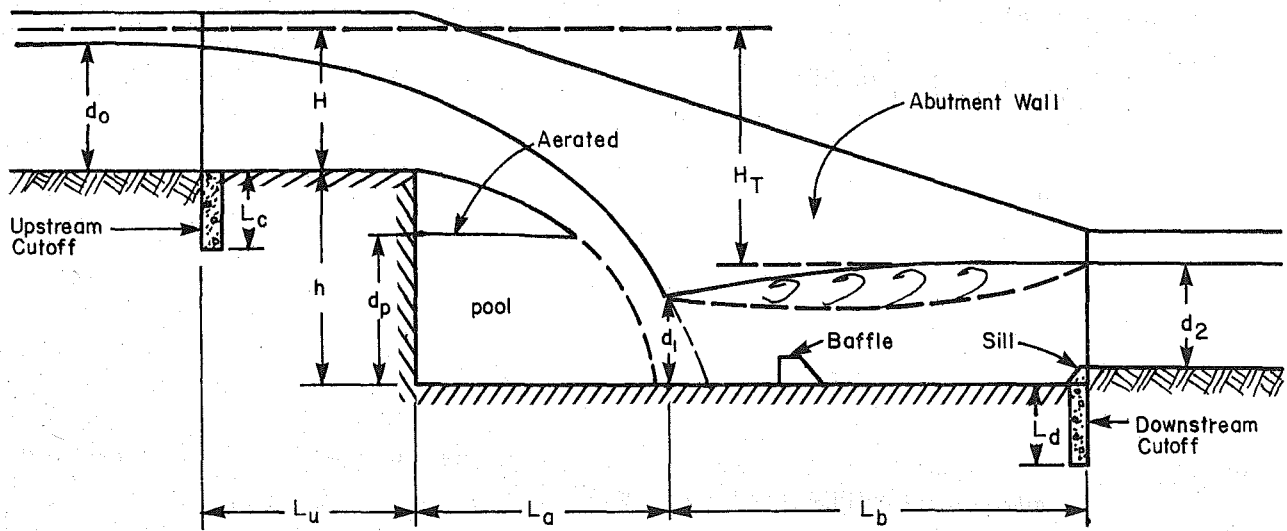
Definition sketch for a vertical drop structure with vertical side walls.
